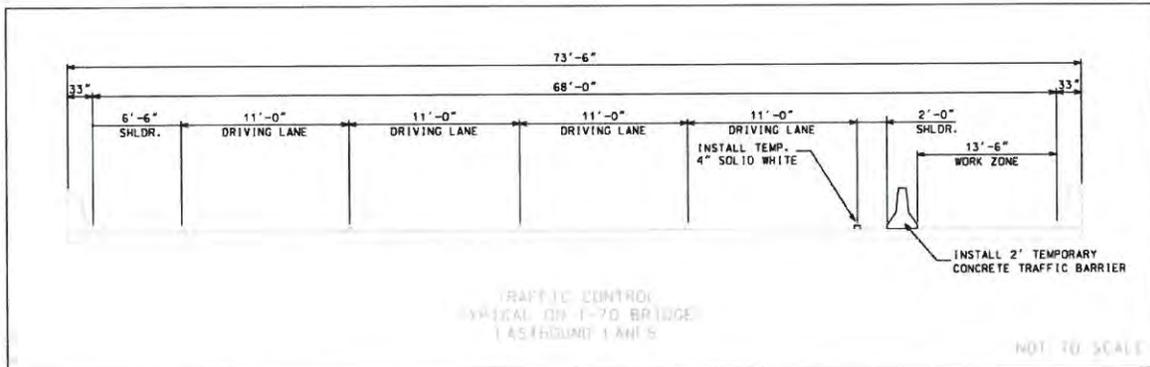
Proposed Eastbound I-70 Blanchette Bridge Typical Section
